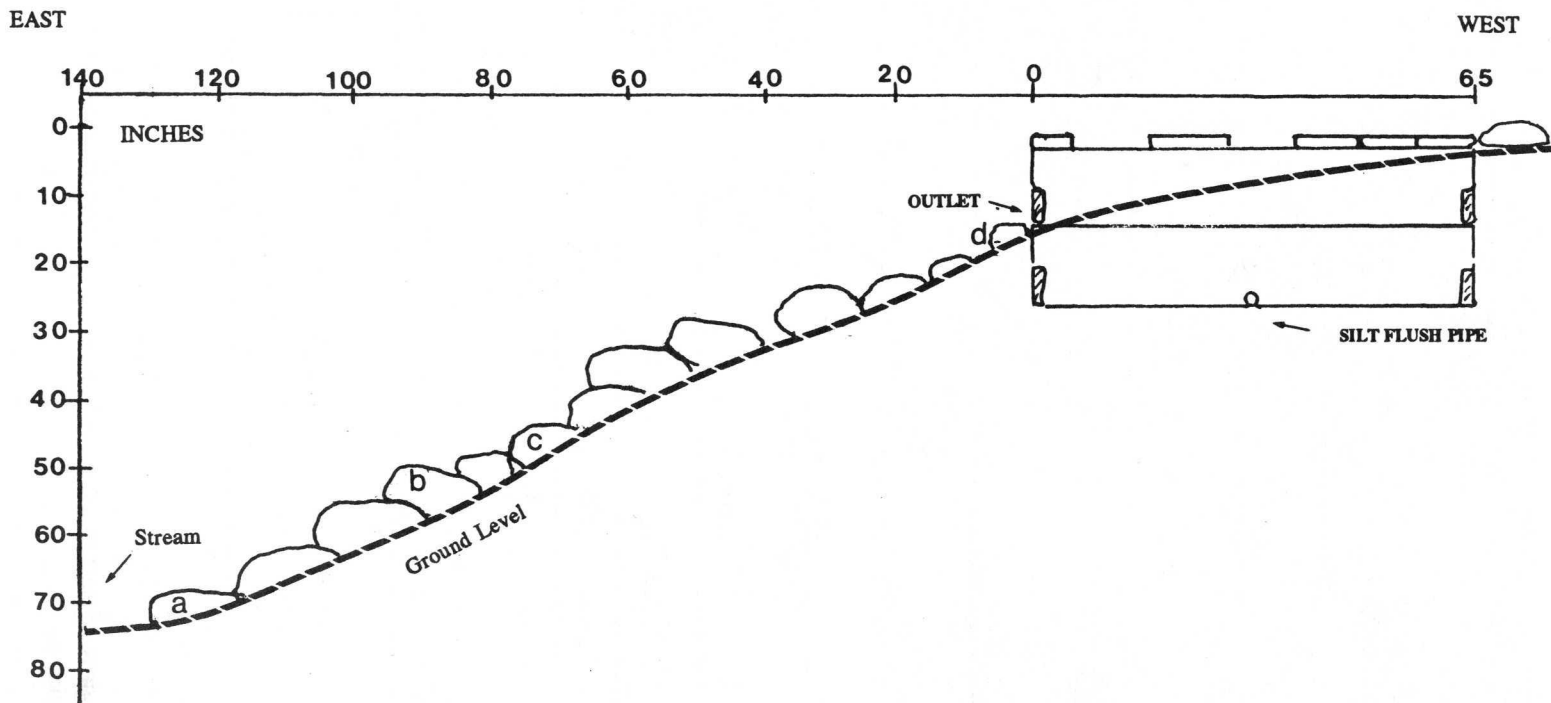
Feature 1, elevation of sedimentation box depicting outlet, flush pipe, and stone-lined embankment.
